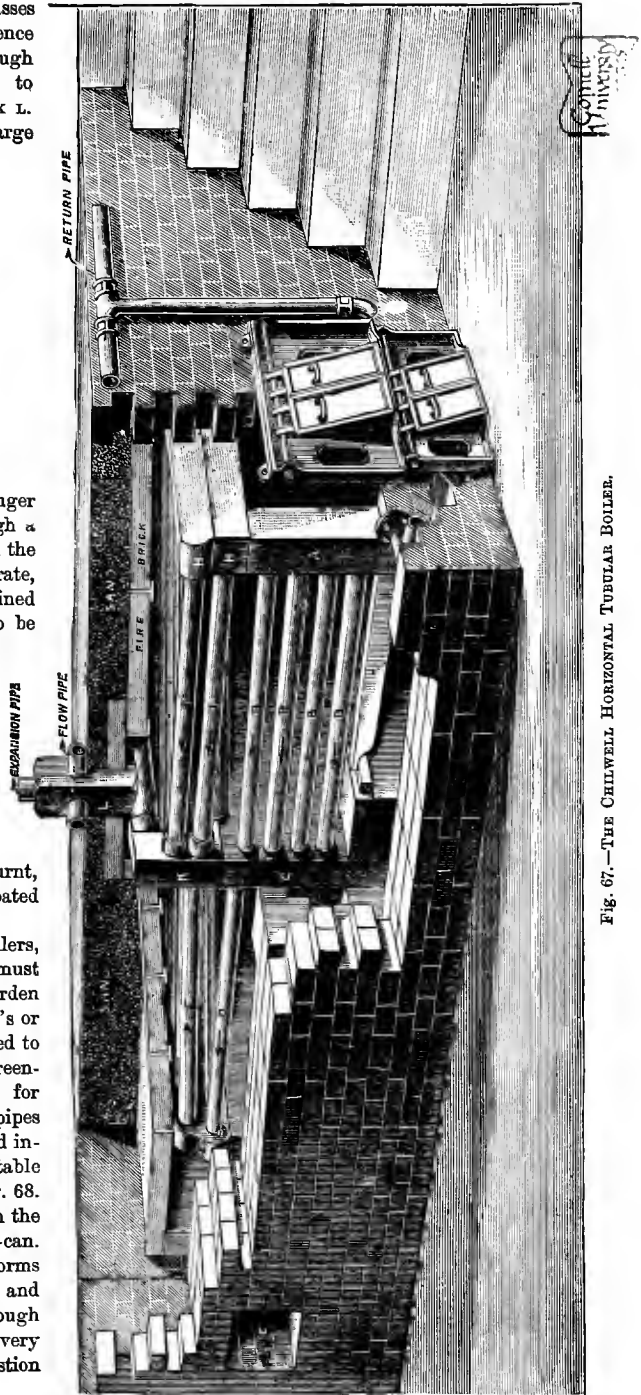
THE CHILWELL HORIZONTAL TUBULAR BOILER.
